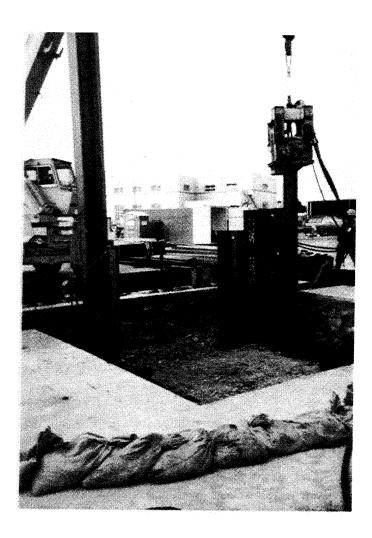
Sheet Piles Emplaced Using a Vibrating Hammer (Courtesy of NFESC and PRC, Inc., 1996)
